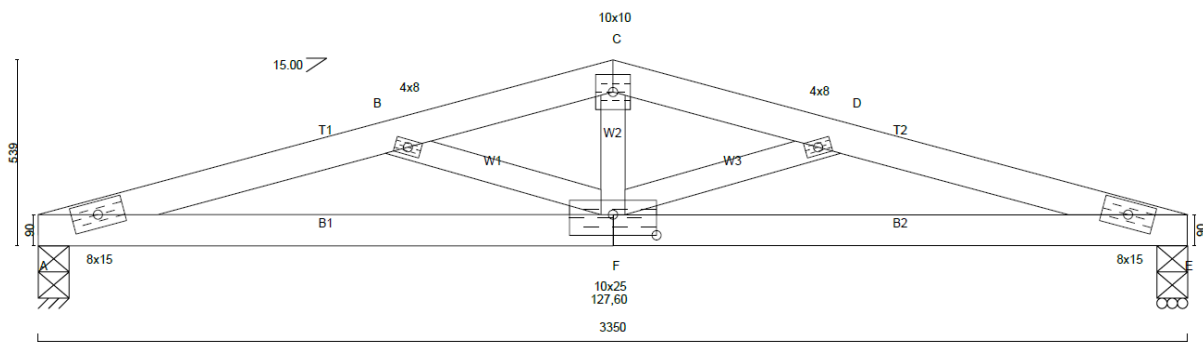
Drawing of roof truss, note the splice at the centre of the bottom chord connected with a truss connector plate
